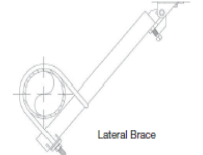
"Fast Clamp" Sway Brace Attachment
